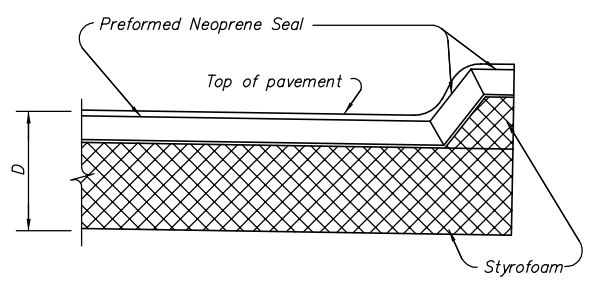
DETAIL OF PRESSURE RELIEF JOINT MATERIAL
